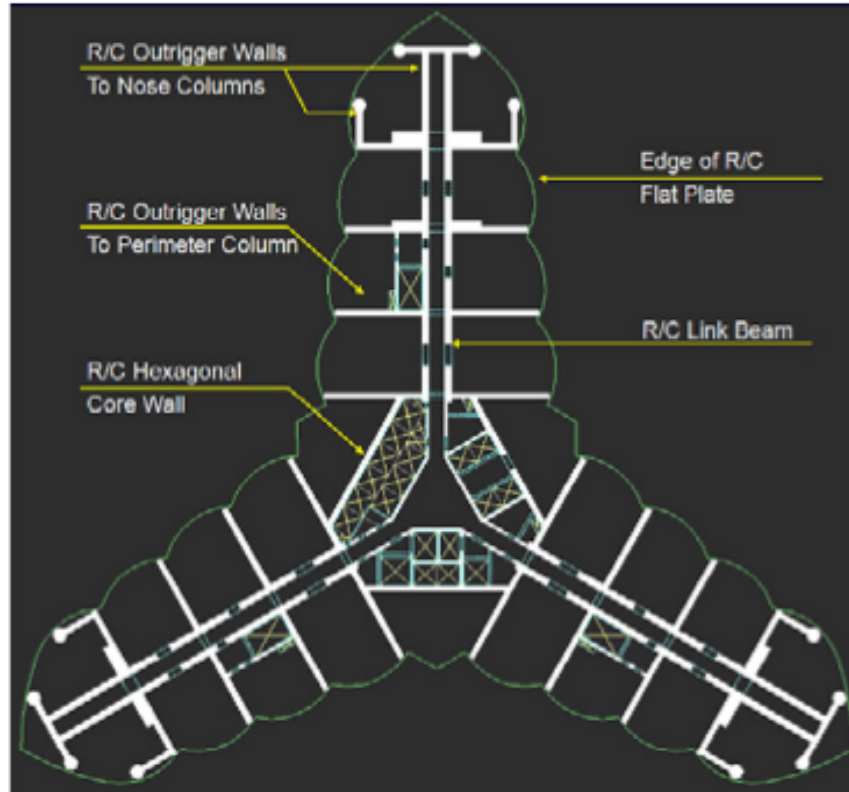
Outrigger structural floorplan (Abdelrazaq, 2012)
